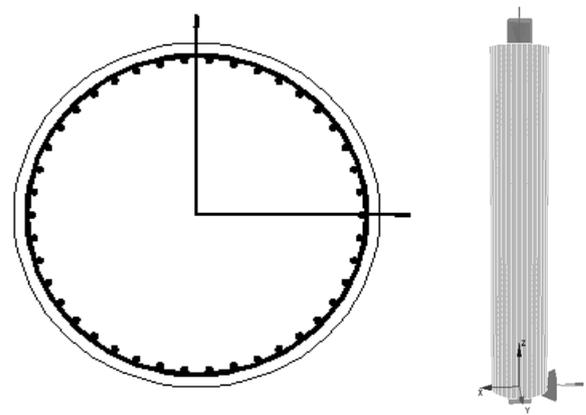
Cross section and elevation of SS reinforced concrete bridge pier.
